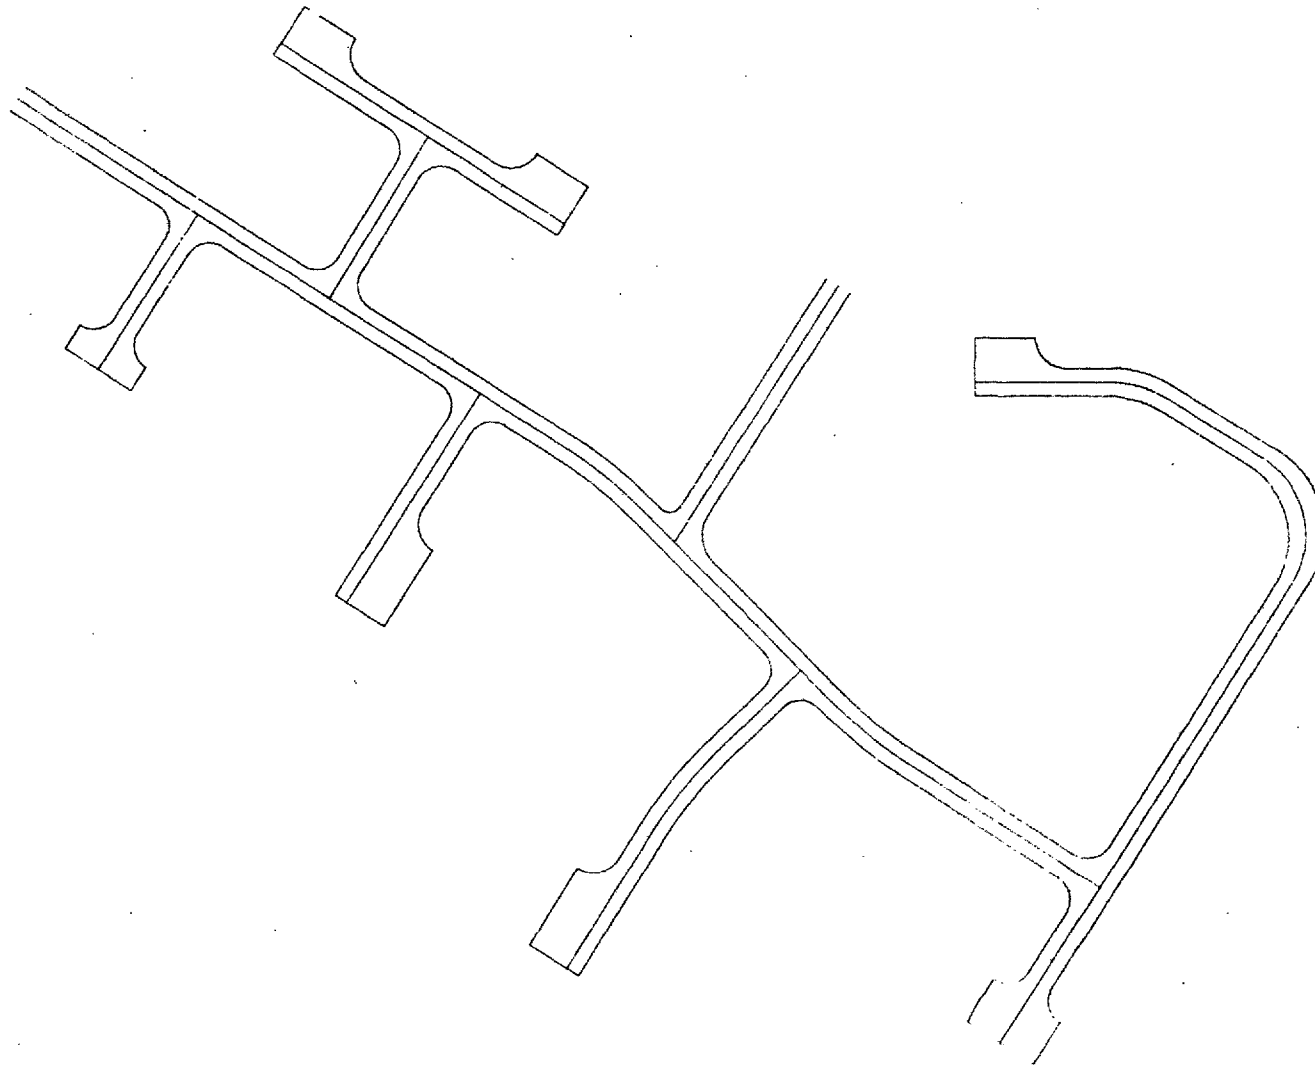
A ROAD LAYOUT AT THE BASIC DESIGN LEVEL
